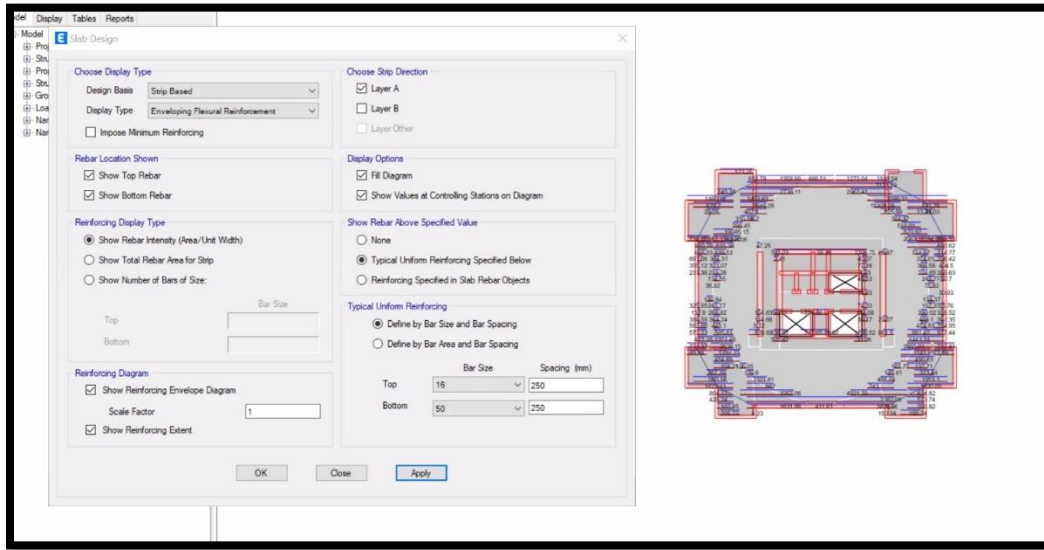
Top Reinforcement in X-Direction for Non-Drop Panels Regions in 96th Floor
